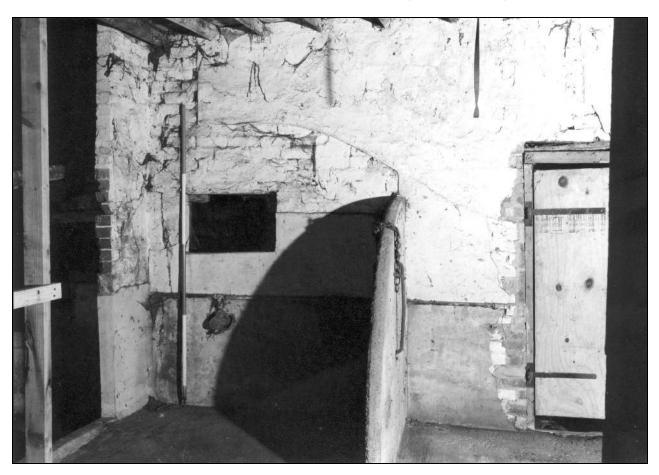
West side of former stable, showing ramped outline of former panelling (film 2, frame 4)
